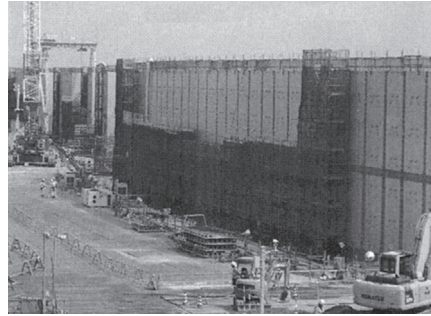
Construction of tsunami barrier wall (Hamaoka nuclear power plant).
